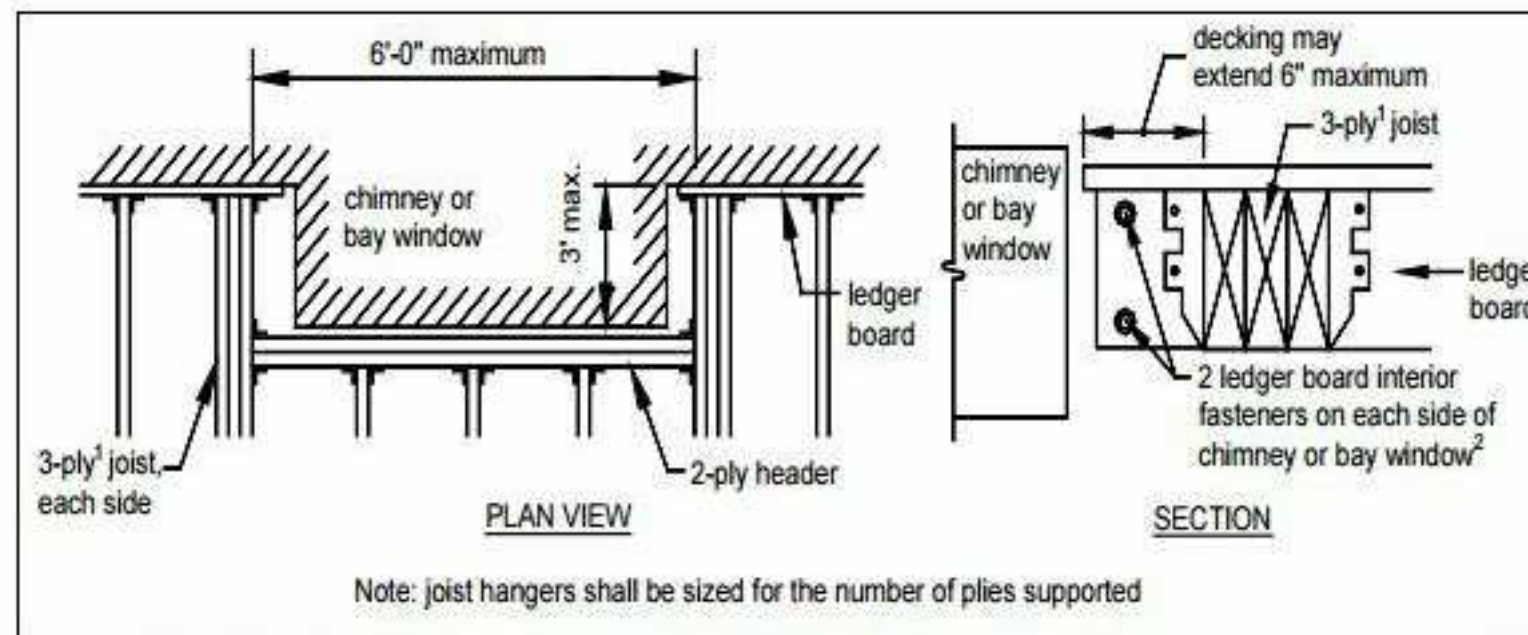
REQUIREMENTS FOR FRAMING AT CHIMNEY OR BAY WINDOW
